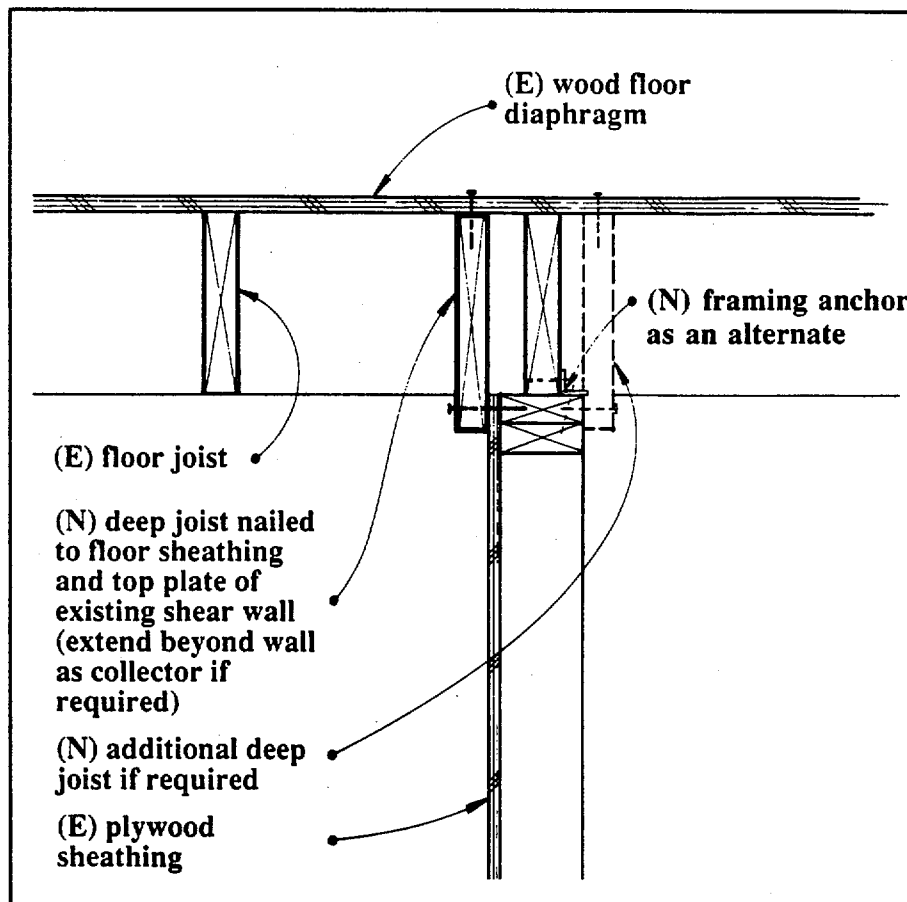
Strengthening the connection of a diaphragm to an interior shear wall (wall parallel to floor joist).
